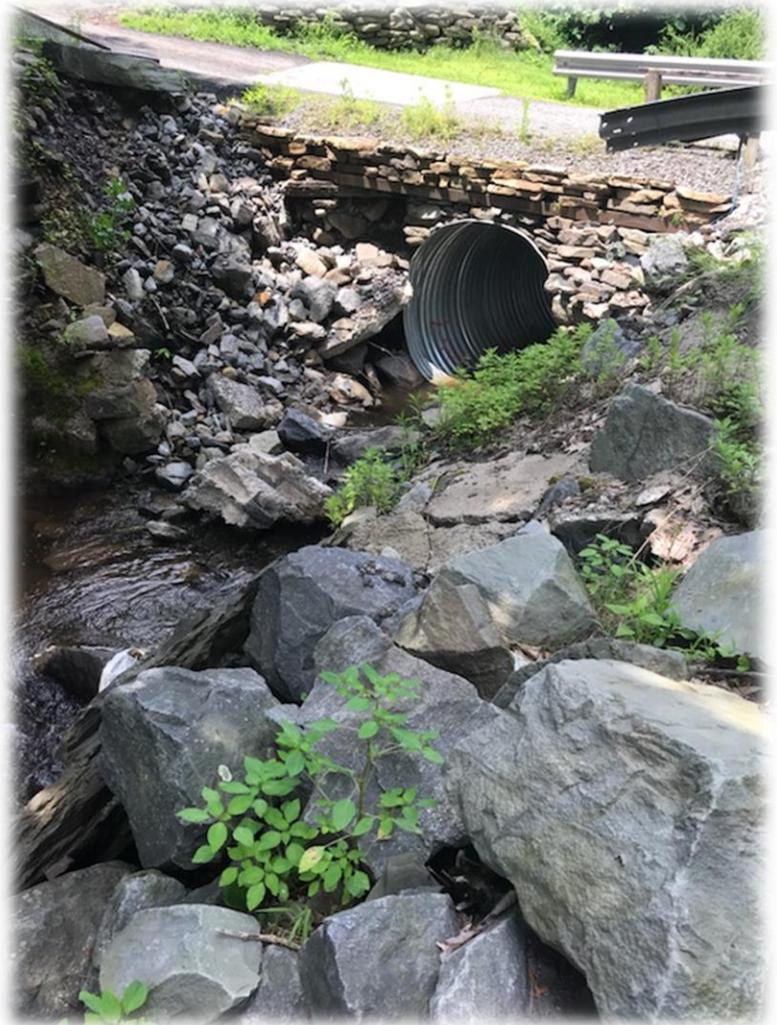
Degrading culvert headwall along West 8th Street. Notice the roadside bank is well armored while the landowner side is showing signs of degradation.
